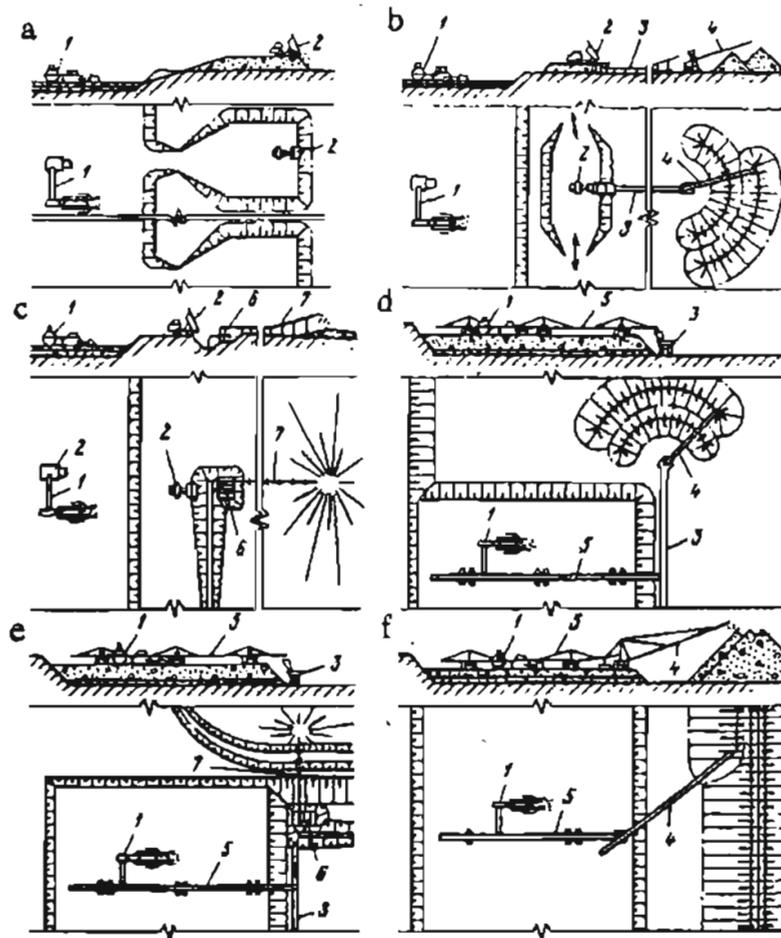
Stripping schemes using the excavating and loading unit (ELU); a - f show ELR working with haul trucks; Stationary belt and stacking conveyors; trucks and slurry pipeline; and with moving, stationary and stacking conveyors; 1 -ELU; 2 -truck; 3 -stationary conveyor; 4 -stacking conveyor; 5 -movable conveyor; 6 -slurry pump; 7 -pipeline (Emelanov, 1985)
